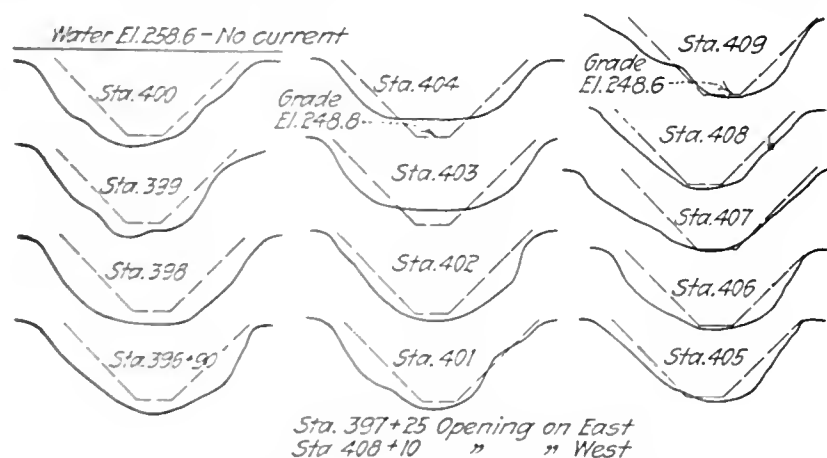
SAMPLE OF DITCH CROSS-SECTION NOTES
